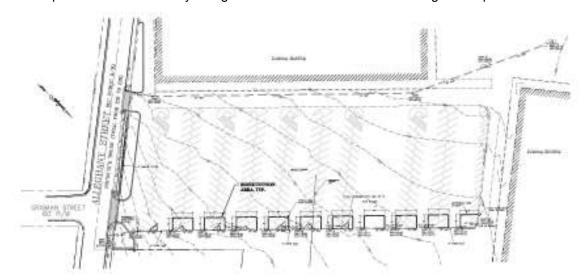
Example Site Plan for Bioretention Area Design
